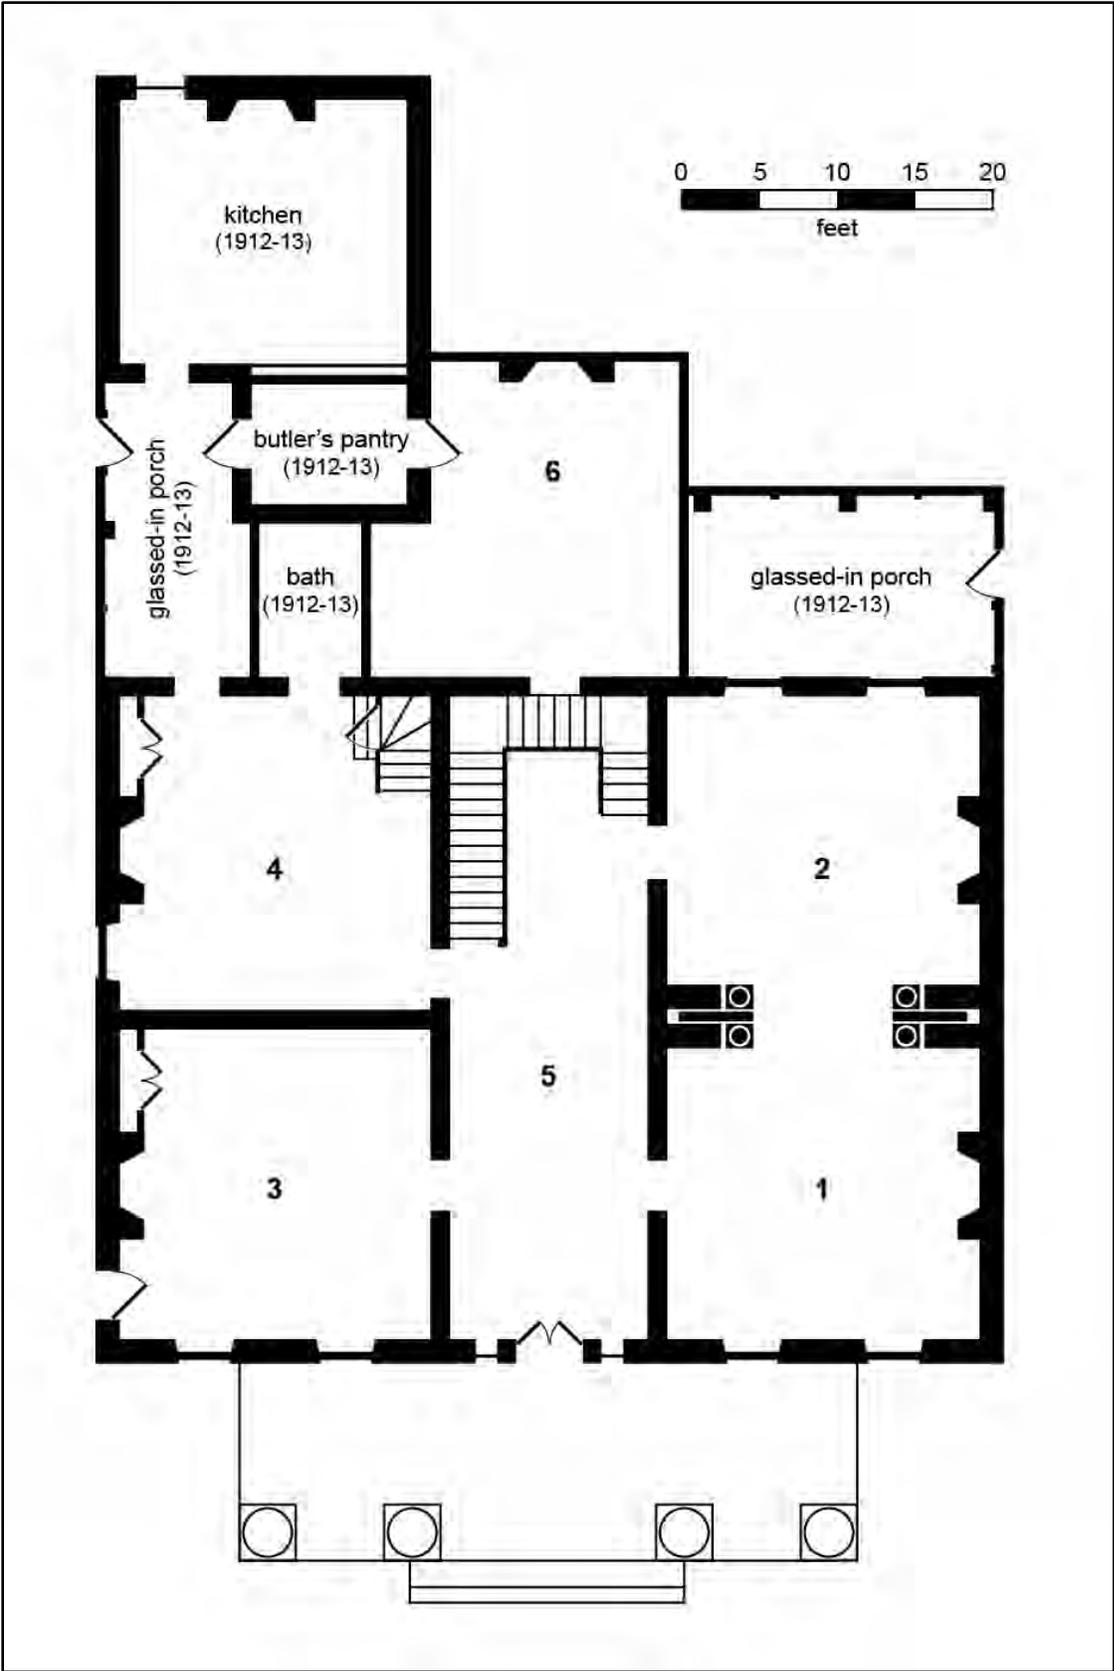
First floor plan of Helm Place. Adapted from the original by Patrick Snadon.
